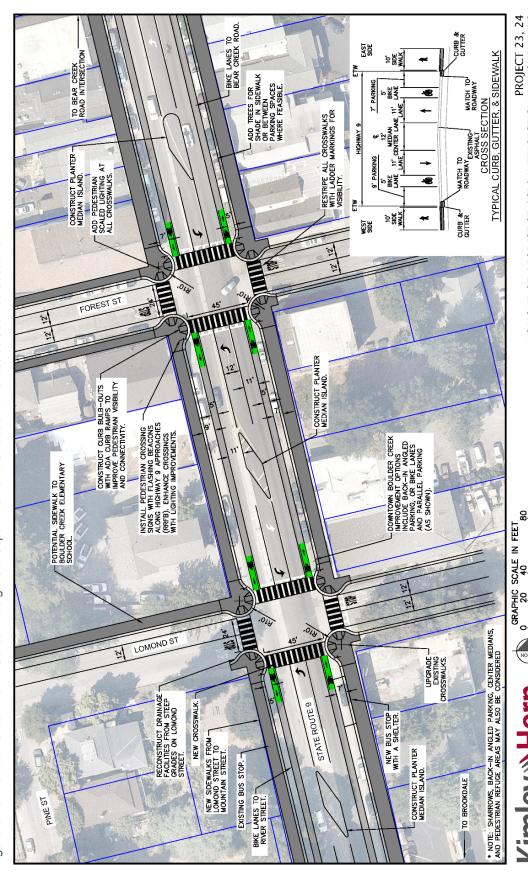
Boulder Creek Town Center Design Concept – Lomond Street and Forest Street Intersections
